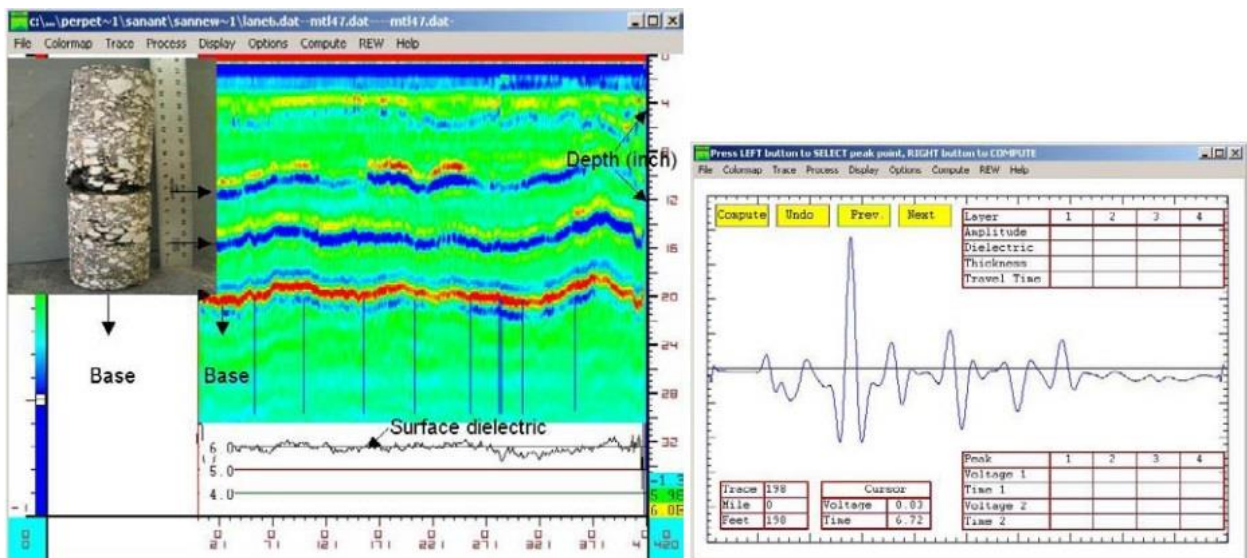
20 inches (500 mm) depth pavement with defects in thick asphalt pavements (Chen and Scullion 2008)
